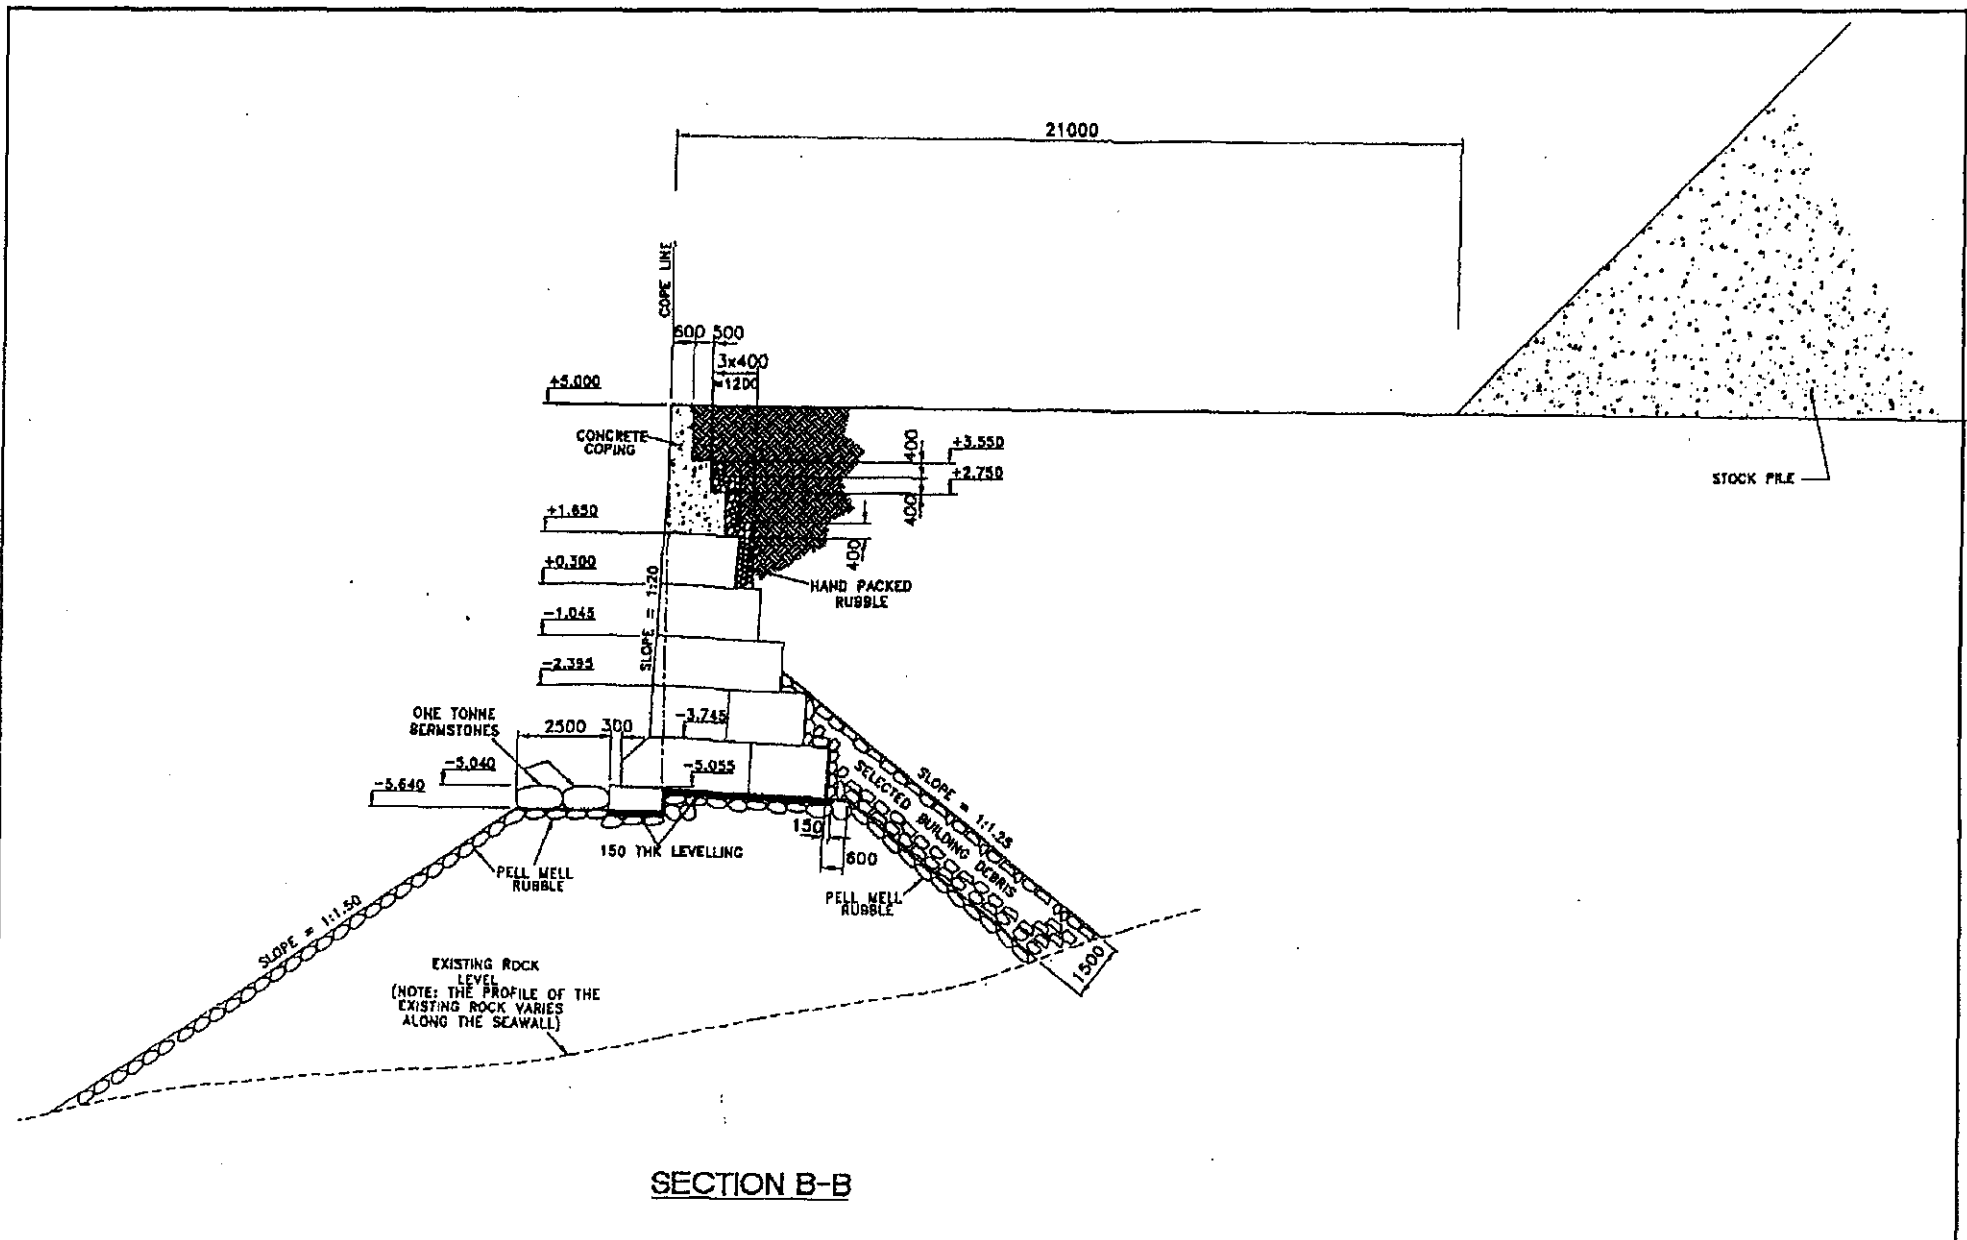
Typical Cross Section of Sea Wall (Section B-B)
